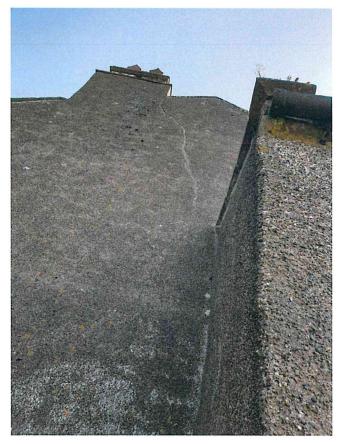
VIEW ON CRACK TO REAR ELEVATION MAIN HOUSE.
